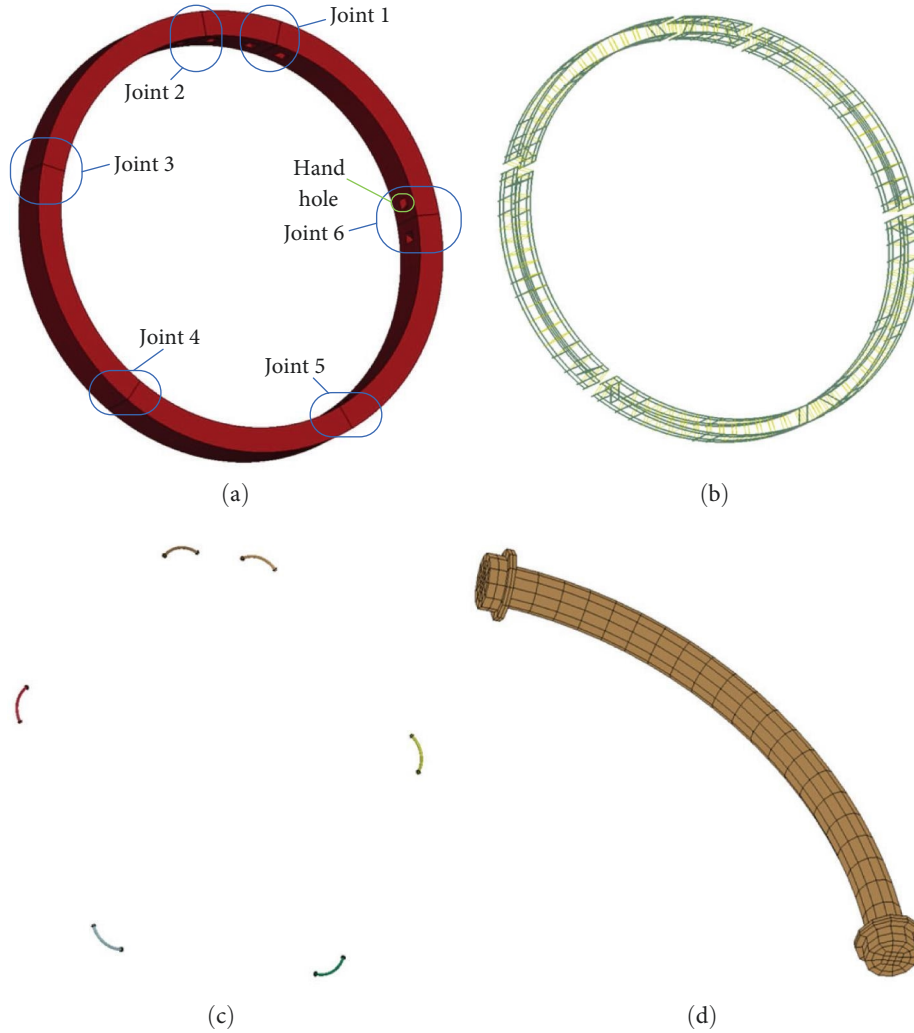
Segmental lining: (a) concrete segments, (b) rebars arrangement, (c) bolts arrangement, and (d) bolt details.
